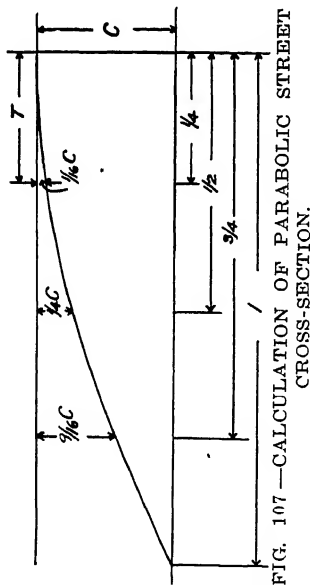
CALCULATION OF PARABOLIC STREET CROSS-SECTION.
